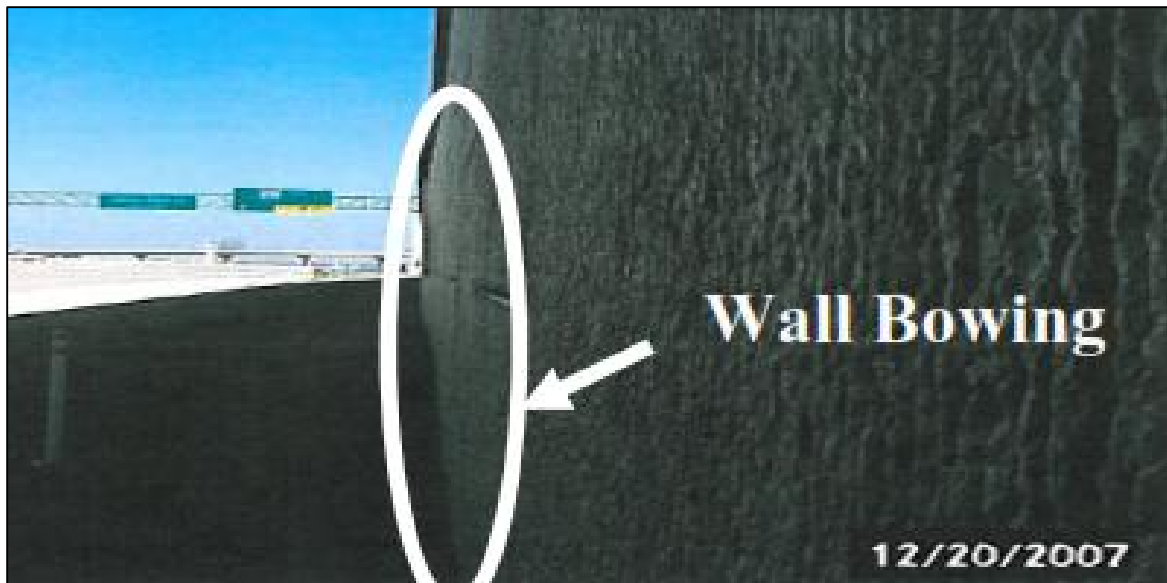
Wall failure during long-term conditions (Adil Haque and Bryant 2011)
